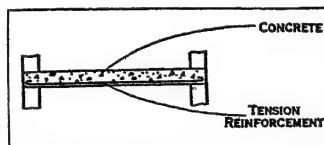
CROSS-SECTION OF SIMPLE REINFORCED FLOOR SLAB
